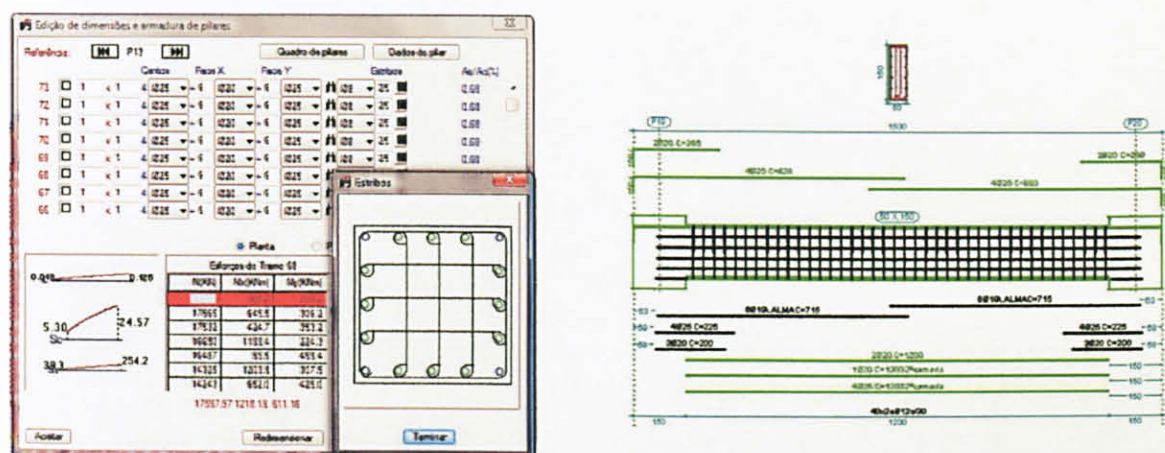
Reinforcement Analysis for Columns, and Beams
